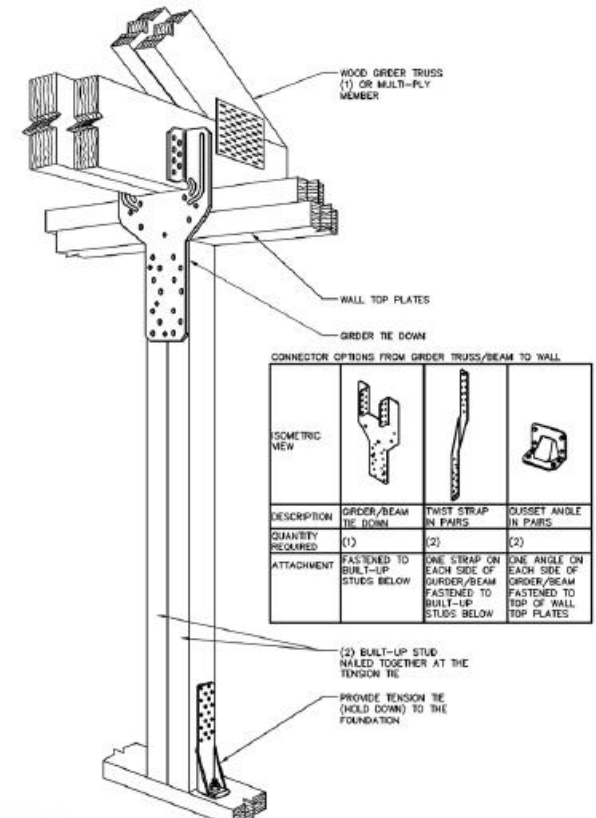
GIRDER TRUSS OR WOOD BEAM TIE-DOWN DETAIL FOR WOOD BEARING WALL.
